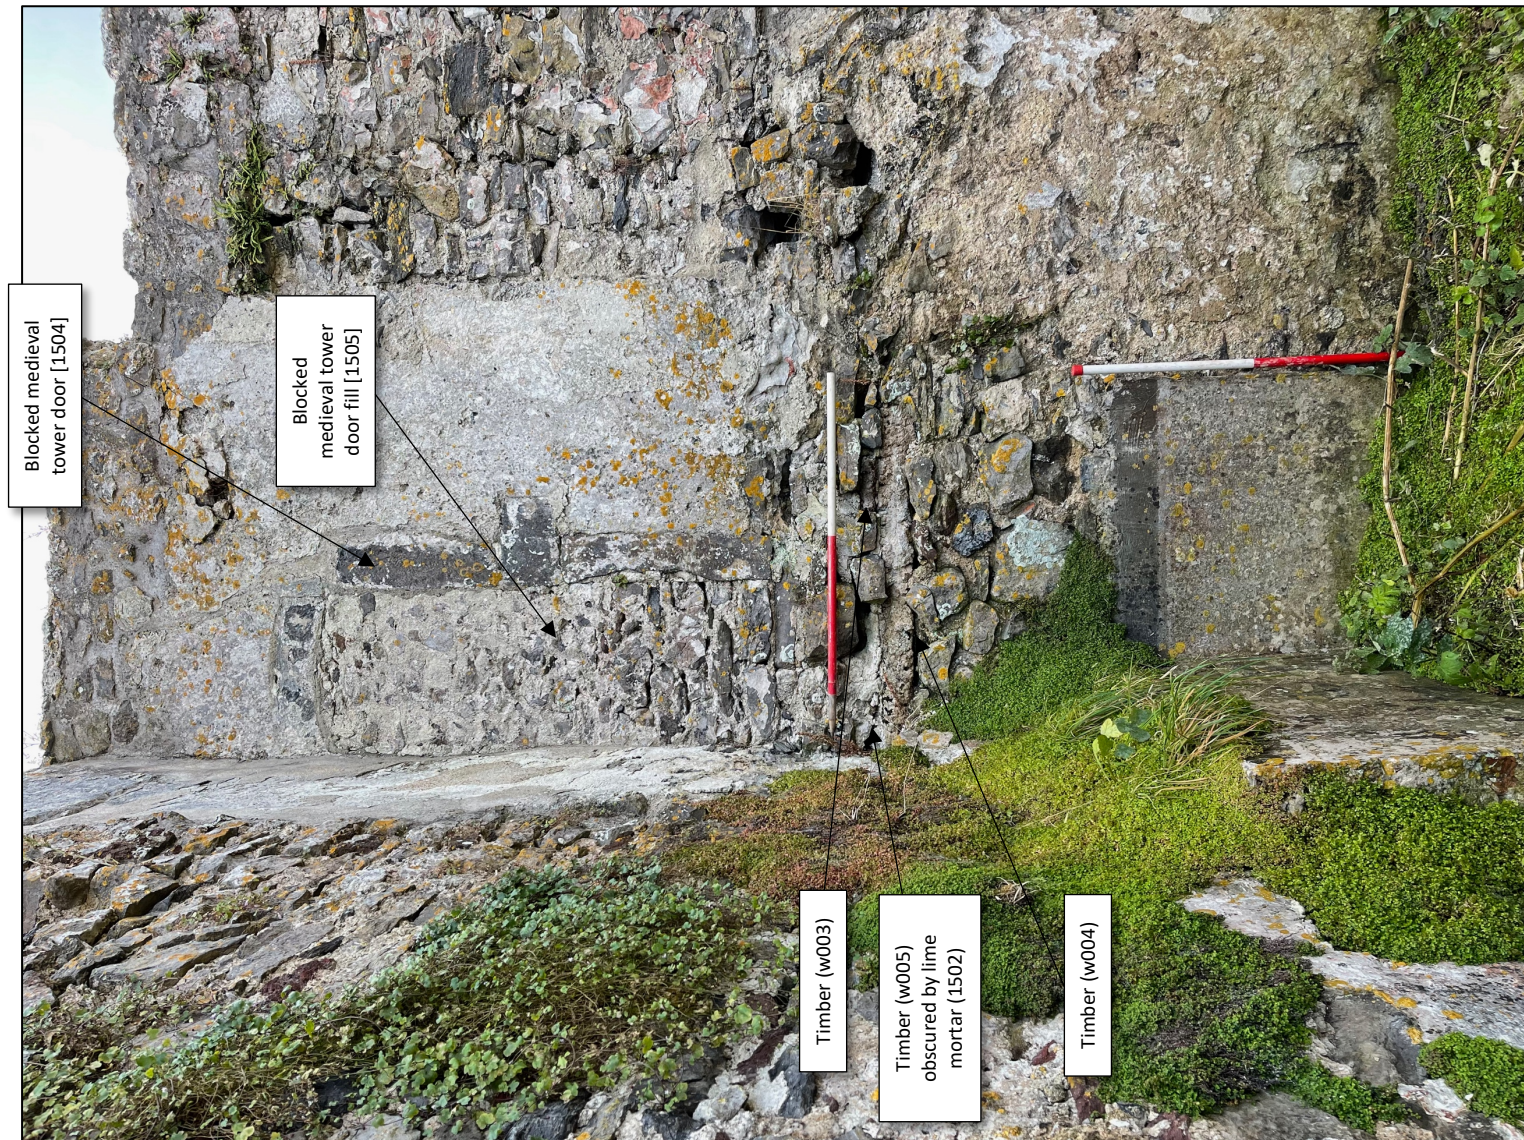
Location 15 Medieval Tower/19<sup>th</sup> Century Kitchen, view of NE facing wall with Timber (w004) *in-situ*.
